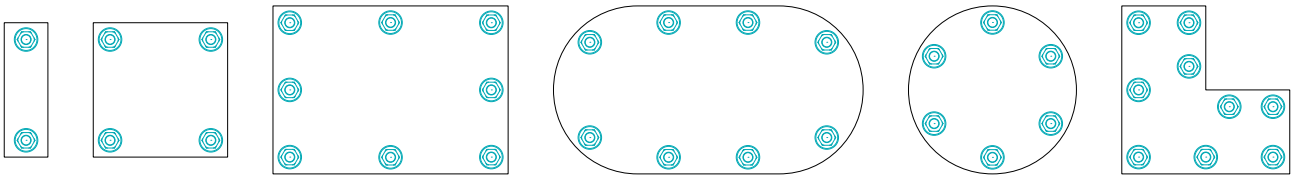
Examples with layout patterns of HULCO® Anchor Bolts.
